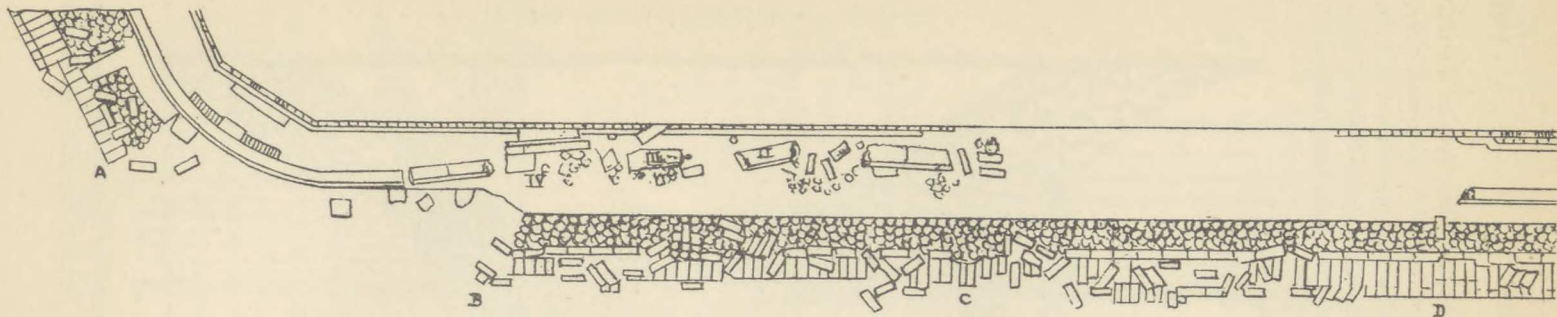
Plan of Portion of Galliera Mole showing extent of damage.
